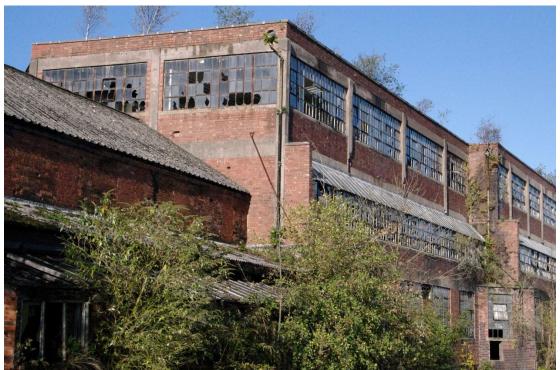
South-east facing end elevation of Building F-L Looking west. Building E on left
